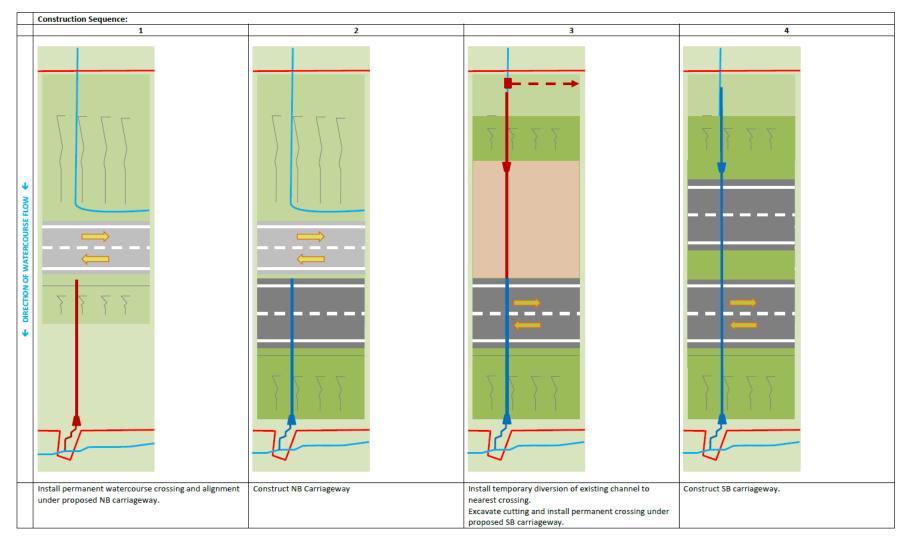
New watercourse crossing – widening to the east (road in cutting) and widening to the west (road on embankment)
